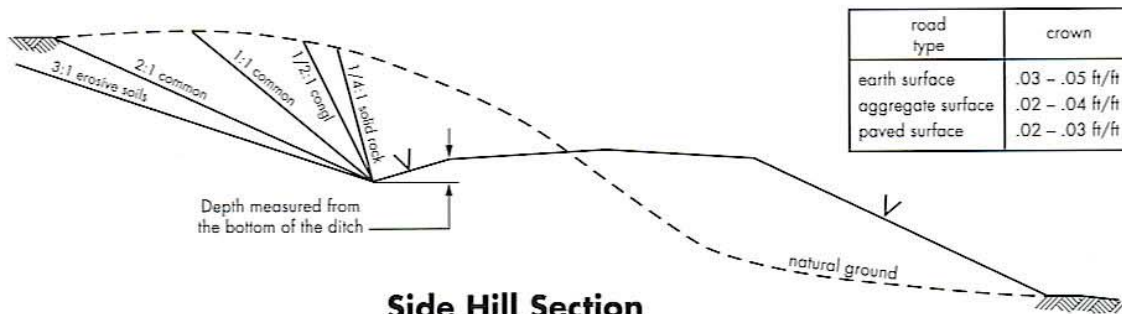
Cross Sections and Plans For Typical Road Sections
